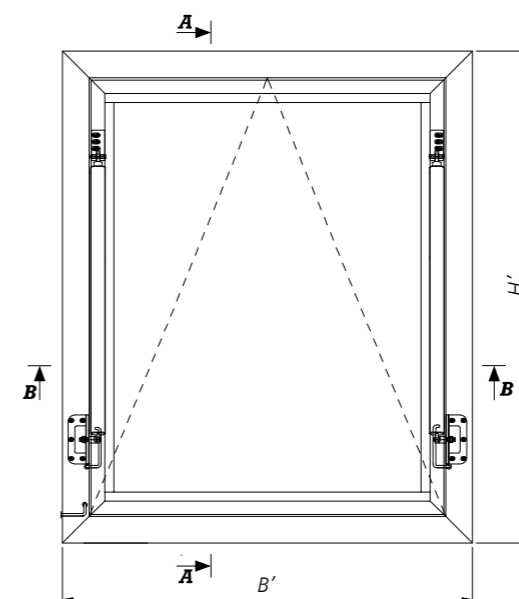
view from inside of the mcr OSO THERM 75 smoke exhaust window with S spindle actuators in closed position
